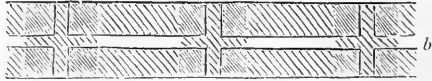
Double Foundations for Head-stones to be placed back to back.
